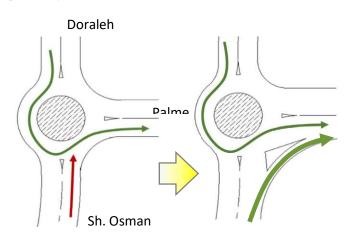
Proposed Palmeraie Road Westside Intersection Improvement
